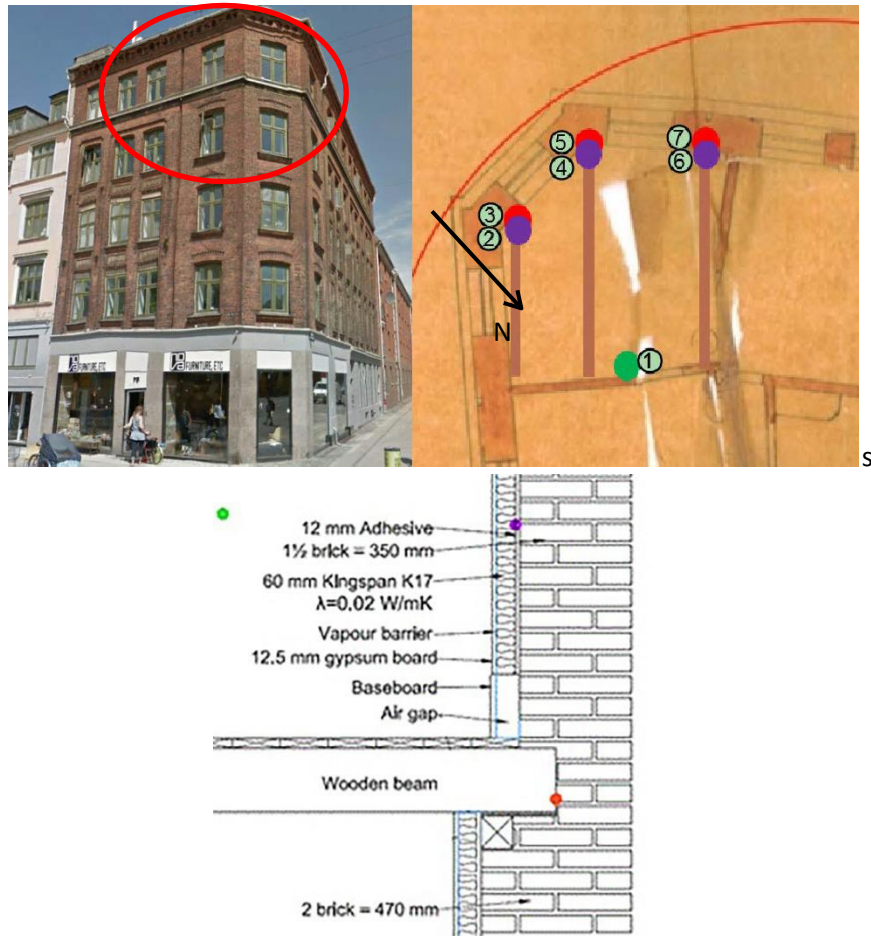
Meinungsgade and indication of wall placement (left), sensor placement on floor plan (middle) and construction with sensor placement (right)
